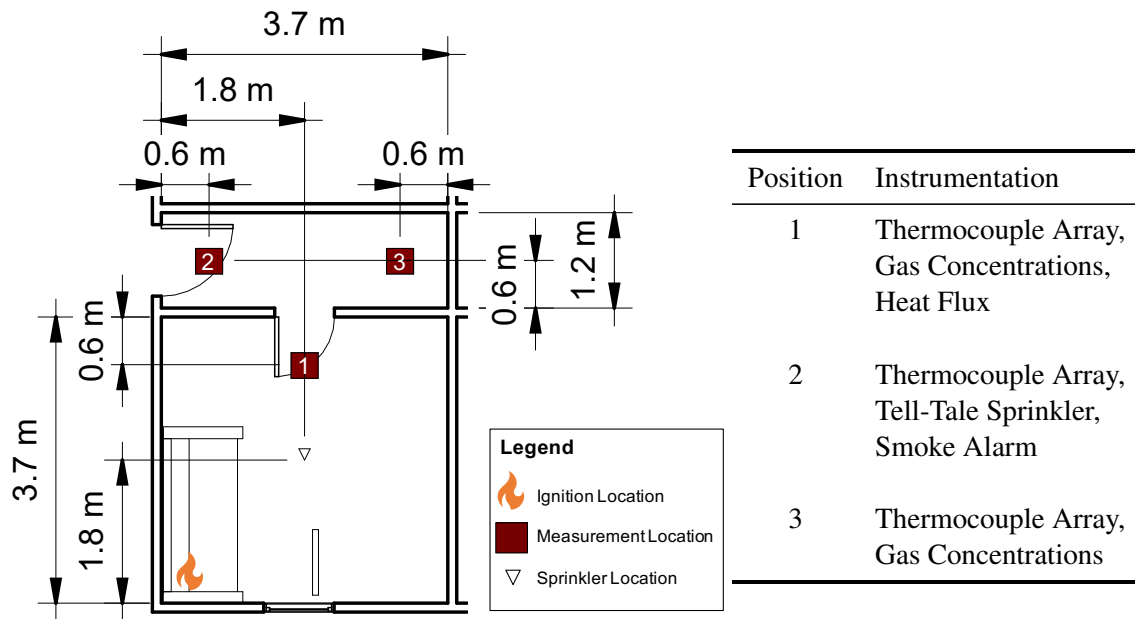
Dimensioned floor plan with the locations of the instrumentation, fuel, and ignition for Experiment 8.
